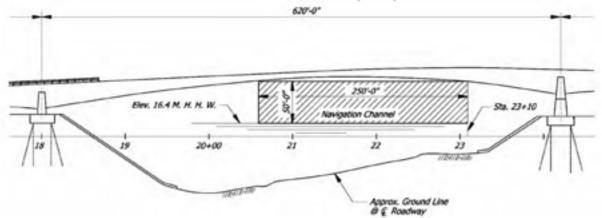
Bridge elevation view with no substructure units in the waterway. (Source: Alaska DOT)
